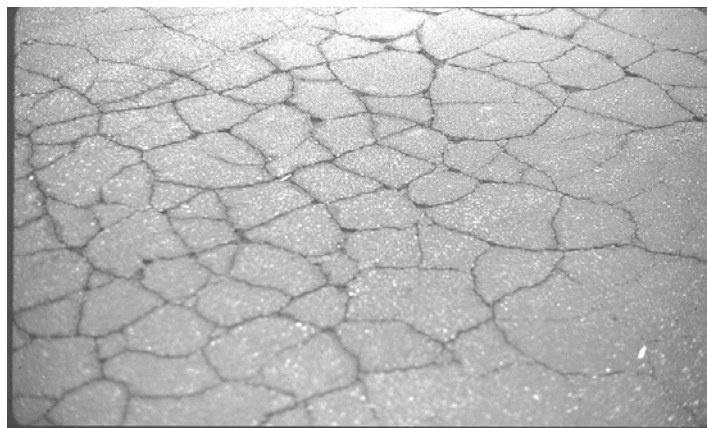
ALLIGATOR FATIGUE CRACKING
